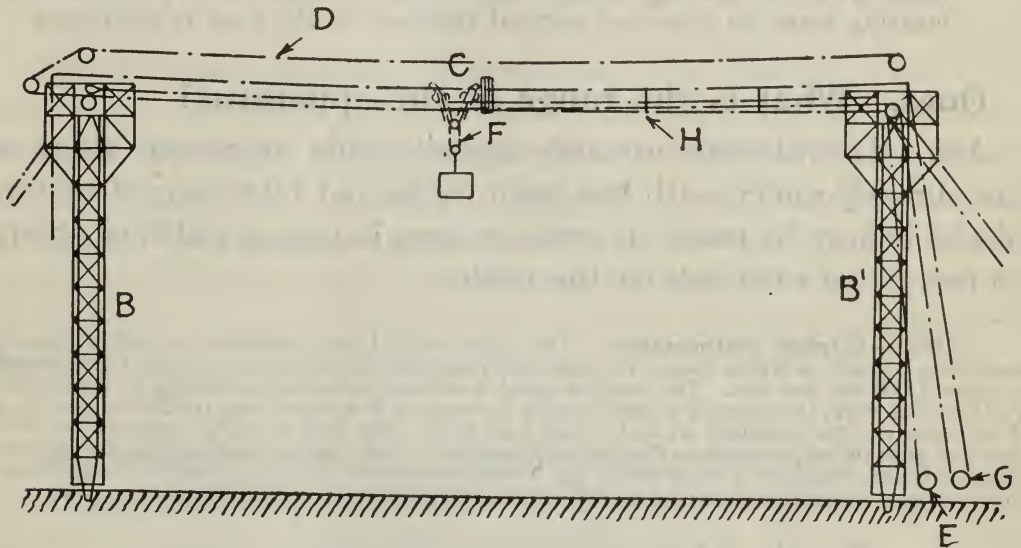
,242.—Cableway. The essential elements of construction are BB' towers; C, cable; D, hauling rope; E, hauling rope drum; F, hoisting rope; G, hoisting drum; H, hoisting rope slack carriers.
